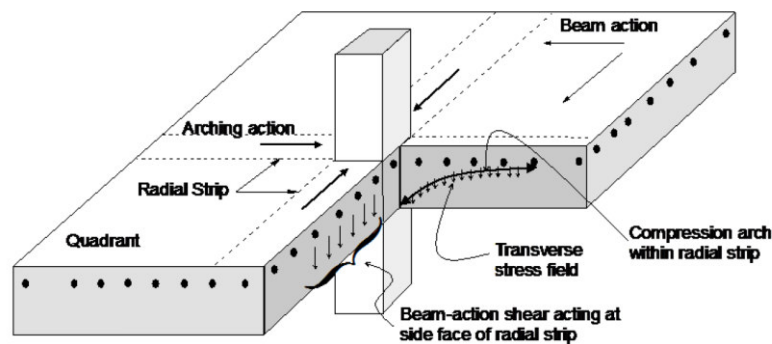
Beam and arching action at column slab-connection, adapted from Alexander [24].
